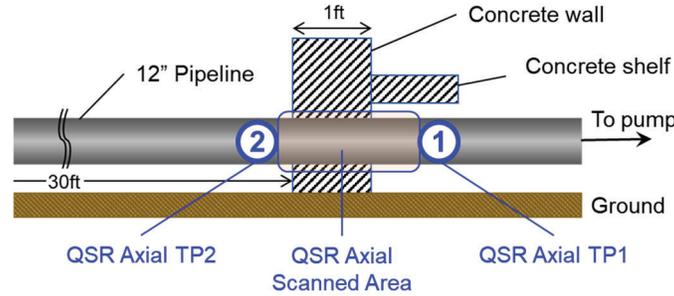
Side view sketch layout of 12" pipe QSR test positions
